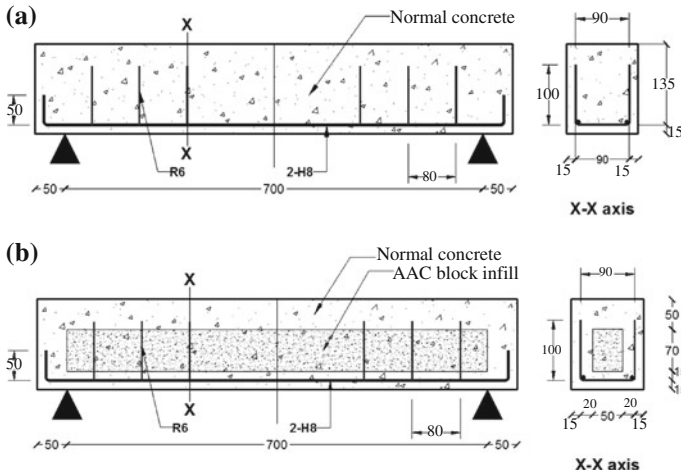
RC beam and RCAI details. a Dimensions of RC beam (specimens of NRC and RC6A). b Dimensions of RCAI
